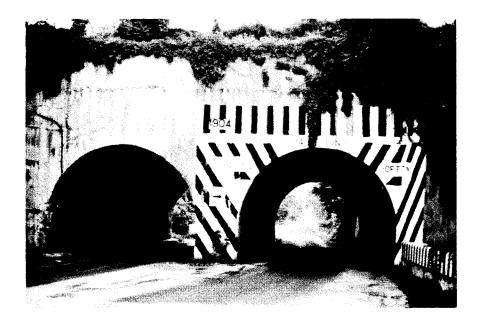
The earliest surveyed concrete arch bridge was this double arch underpass, built in 1904 in Stafford County.
